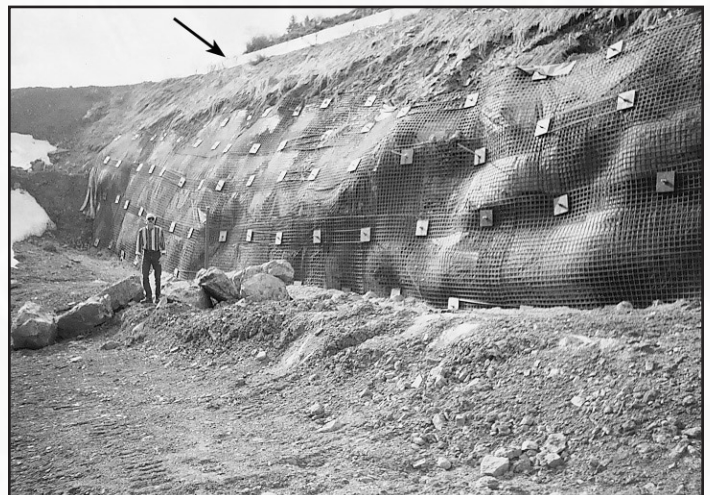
Completed upper soil nail wall at Elbow Slide. This wall stabilized the highway (note temporary highway barriers shown by arrow) during the period when construction was prohibited.
